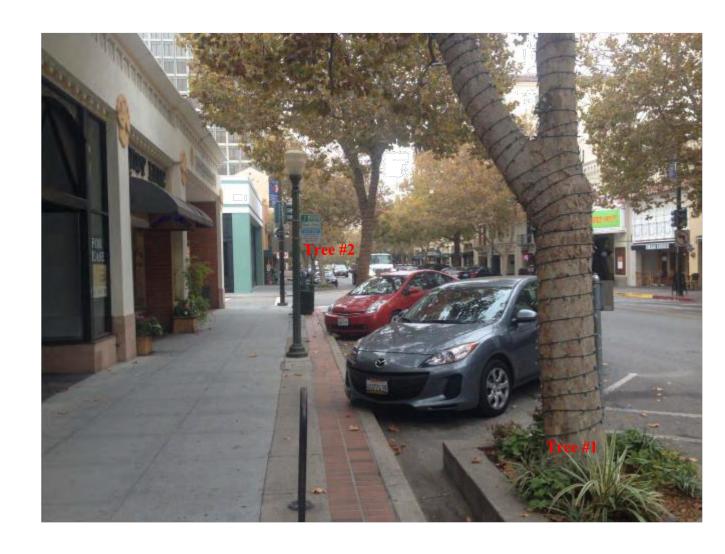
Trees #1 and #2 looking east. Type III fencing is recommended due to limited space from parking areas
